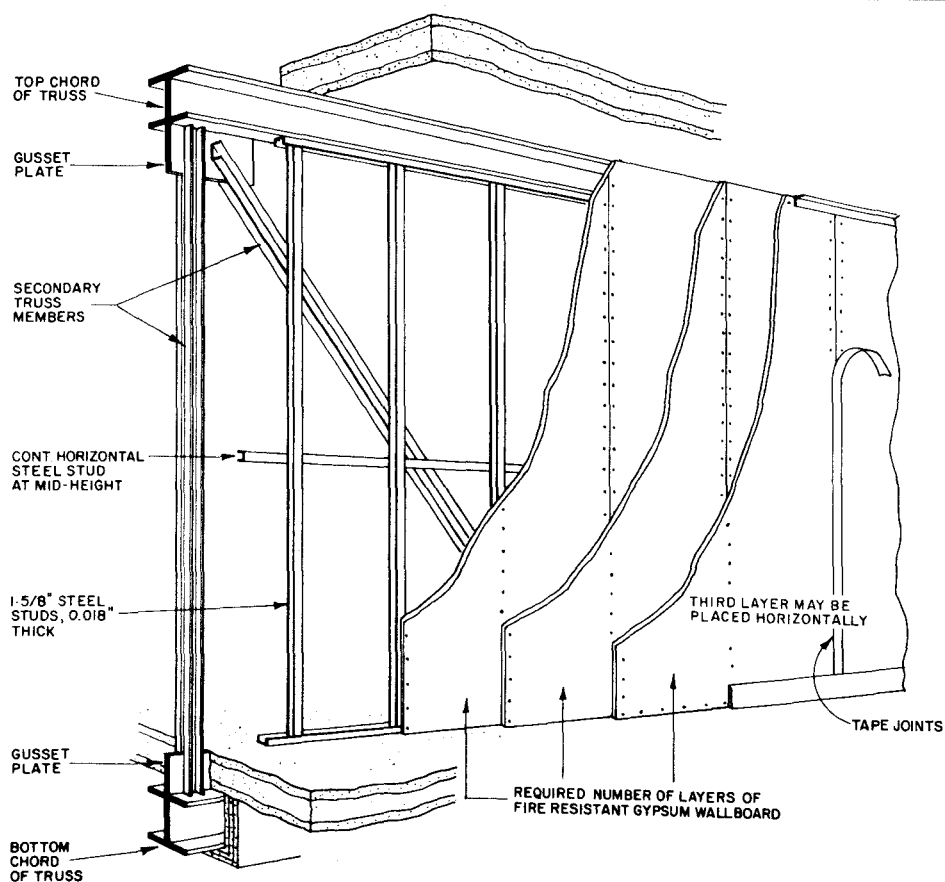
Cutaway drawing showing a staggered truss protected with gypsum wallboard on steel studs.
